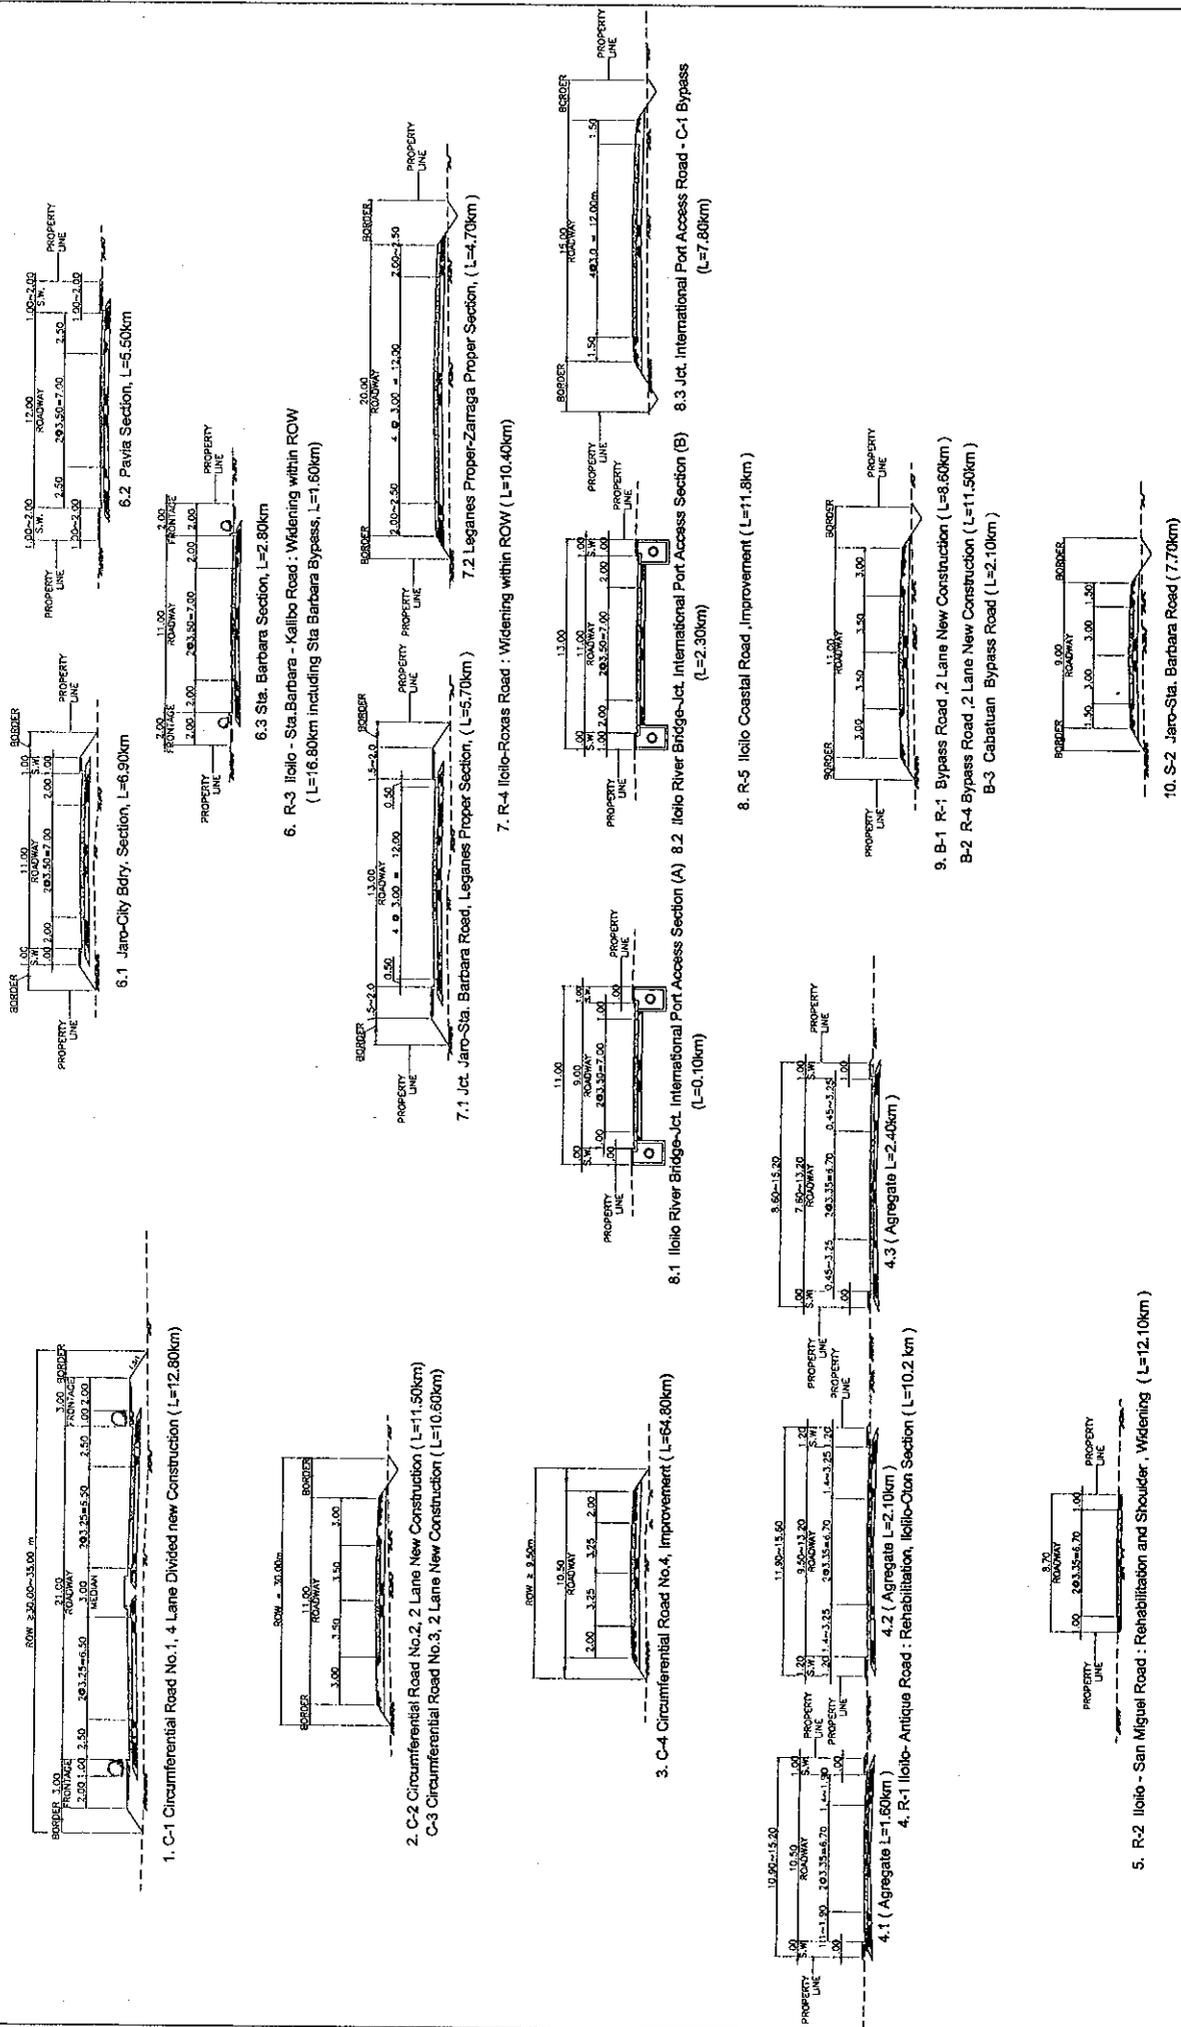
ILOILO : Proposed Cross-Section for New Road and Widening
